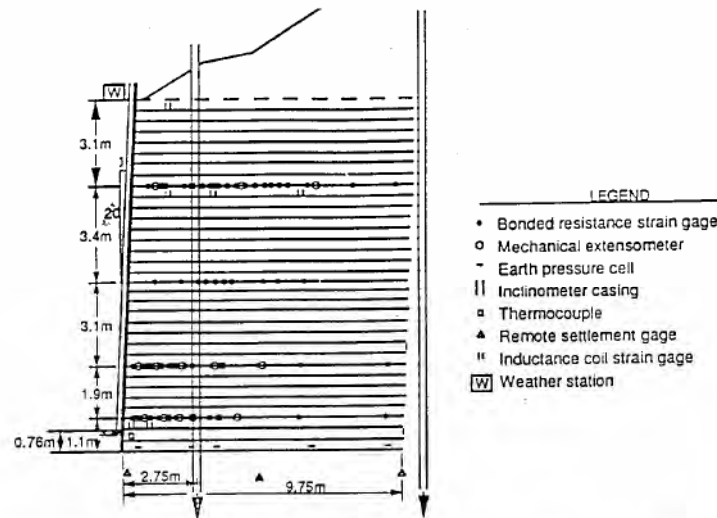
Instrumentation cross section of Rainier Avenue wall. (after Allen et al. 1992)
